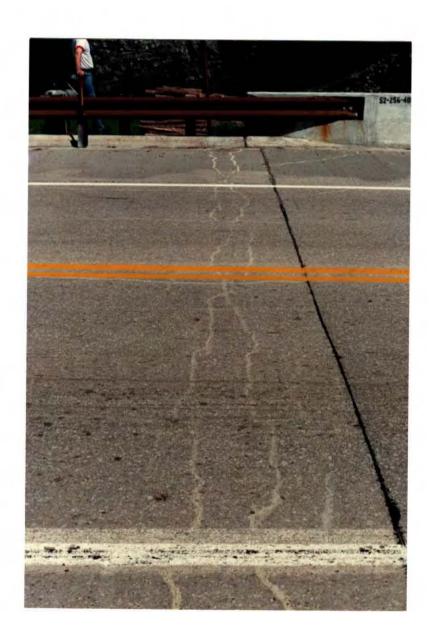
Photograph of typical crack development in approach slab. Cracks in this photograph have been filled and sealed. Structure No. 52-256-401 on US 16 at mile marker 42.64 in Pennington Co.
